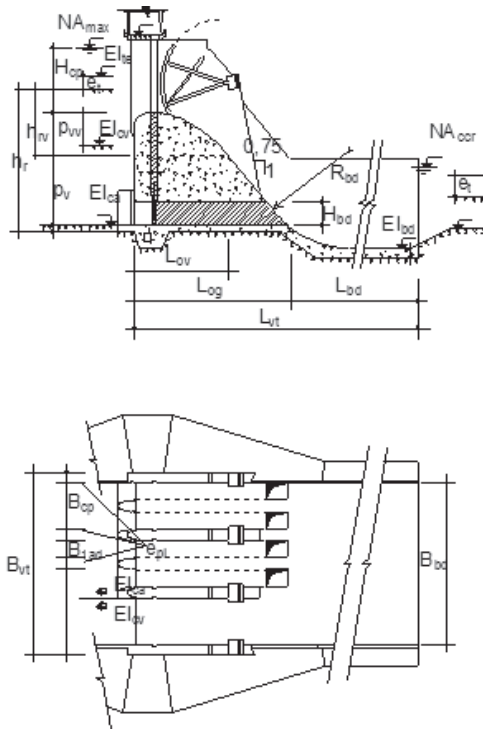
Typical cross-section and plan of a surface spillway with a high ogee crest and a stilling basin.
